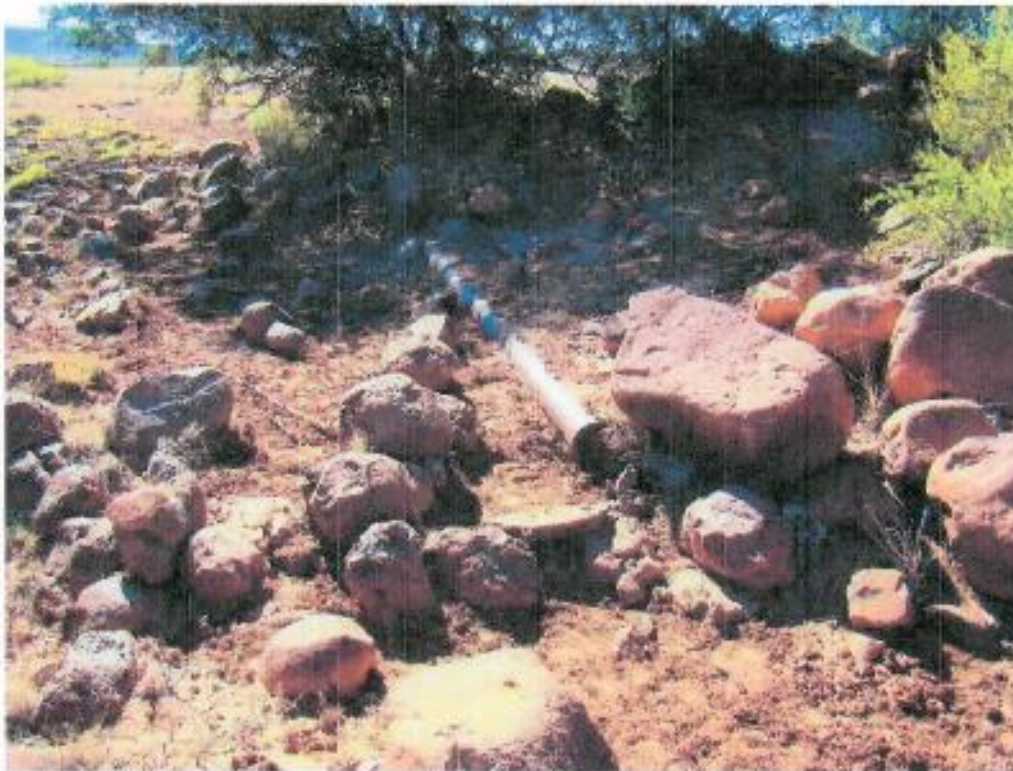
Demolished section in the middle of the dam retainer wall exposes a water pipe
